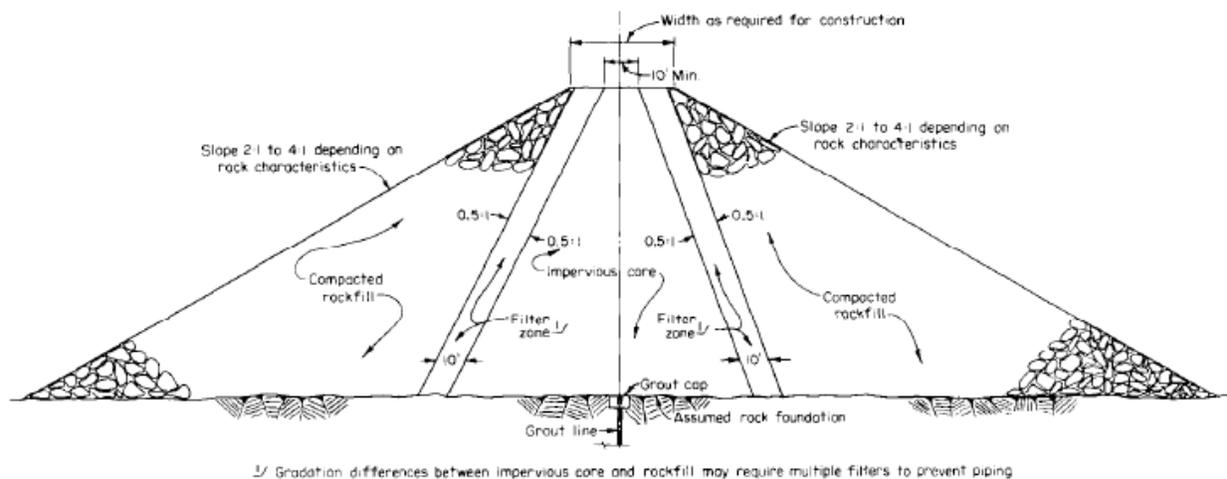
Typical maximum section of an earth-core rockfill dam using a central core. 288-D-2800.
